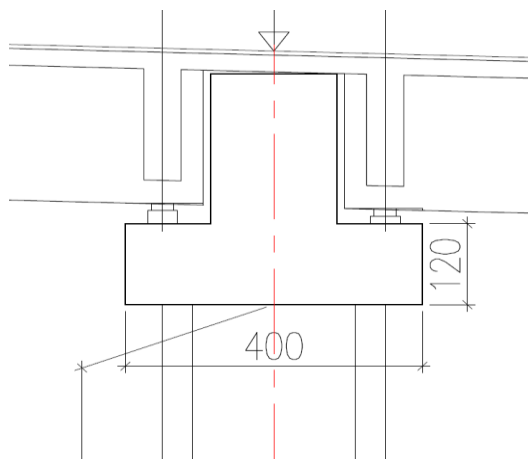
Profile view of pier axis P1 to show the pier cap details
